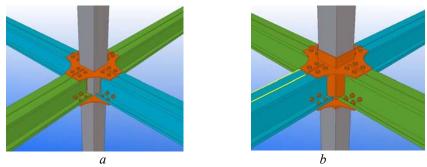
Selected joint typologies for beam to column connection: a – simple joint; b – strengthened joint.
